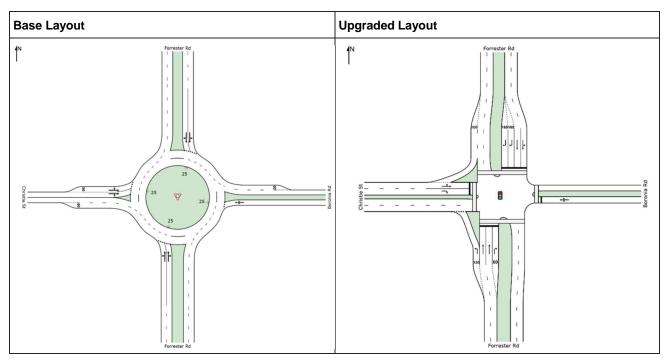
2021 without Links Road extension - Forrester Road/Christie Street/Boronia Road
